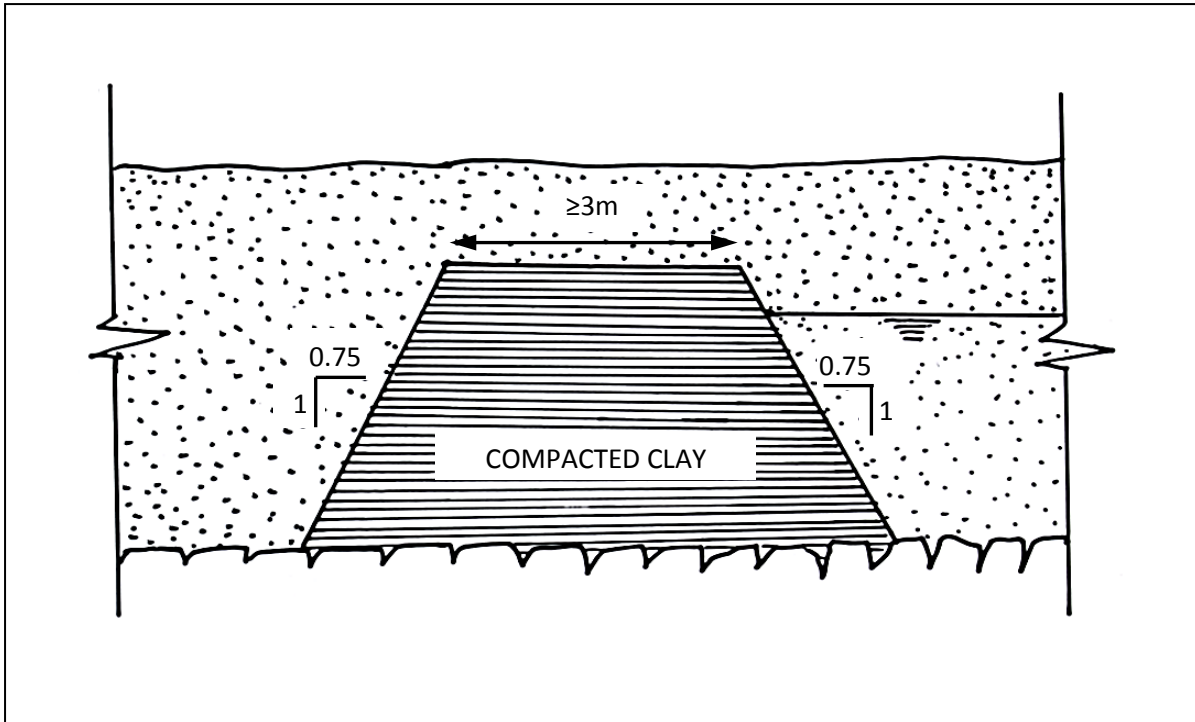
Minimum Dimensions for Sub Surface Dams
